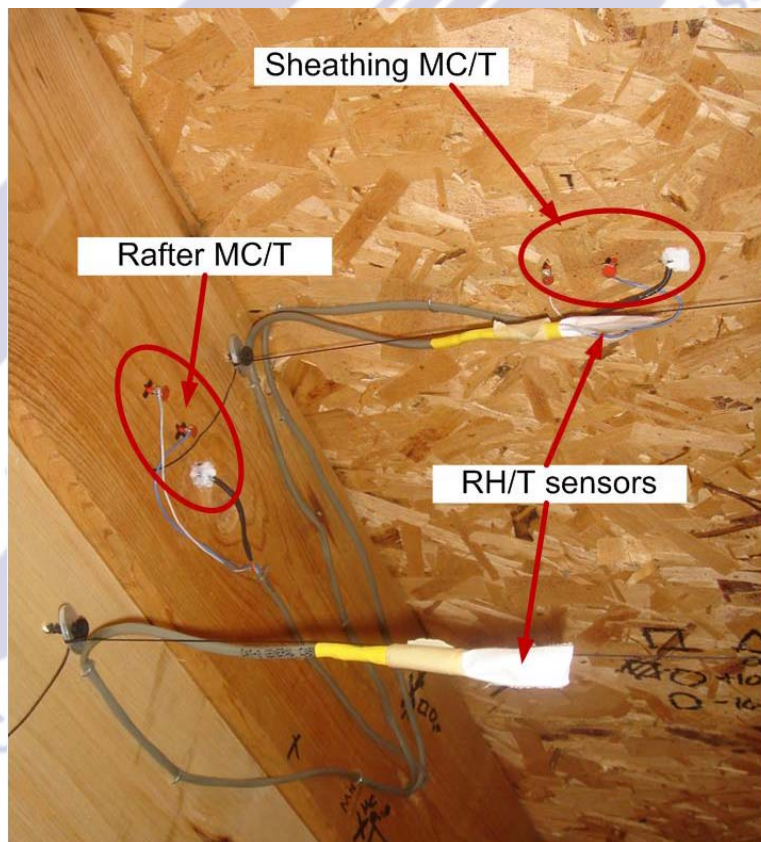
Typical sensor configuration - unvented roof assemblies.
